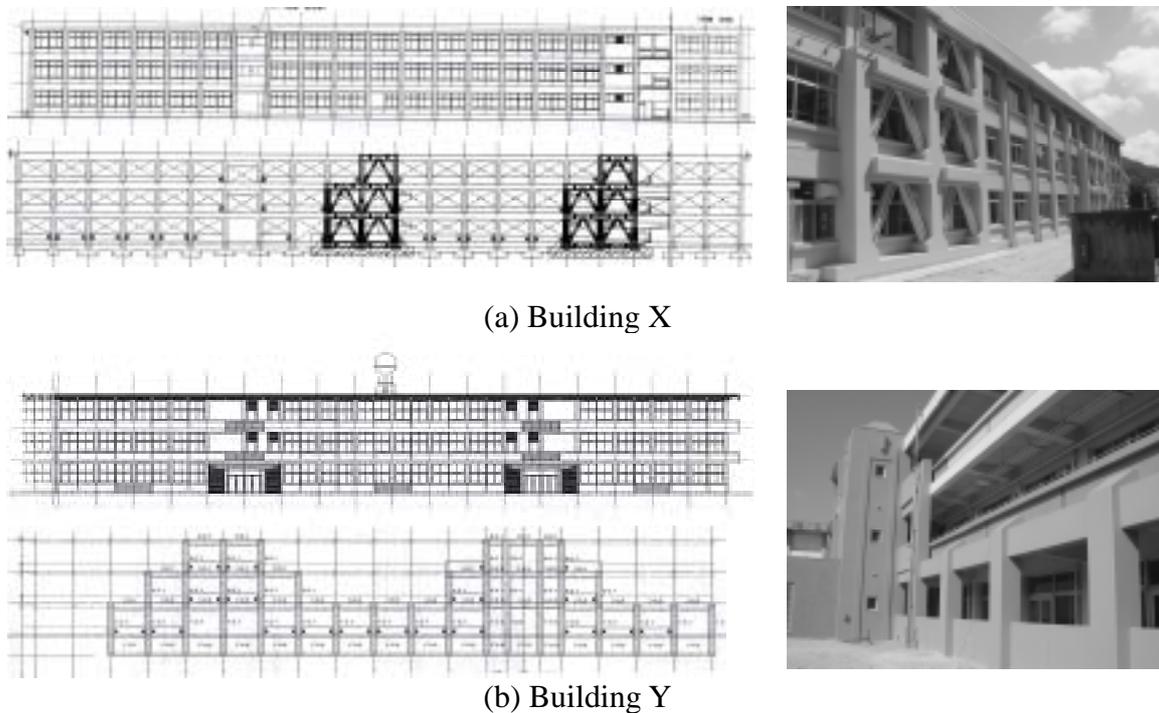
Elevation and added structural frame (left) and photographs after retrofit (right) of the two school buildings in Hiroshima Prefecture
